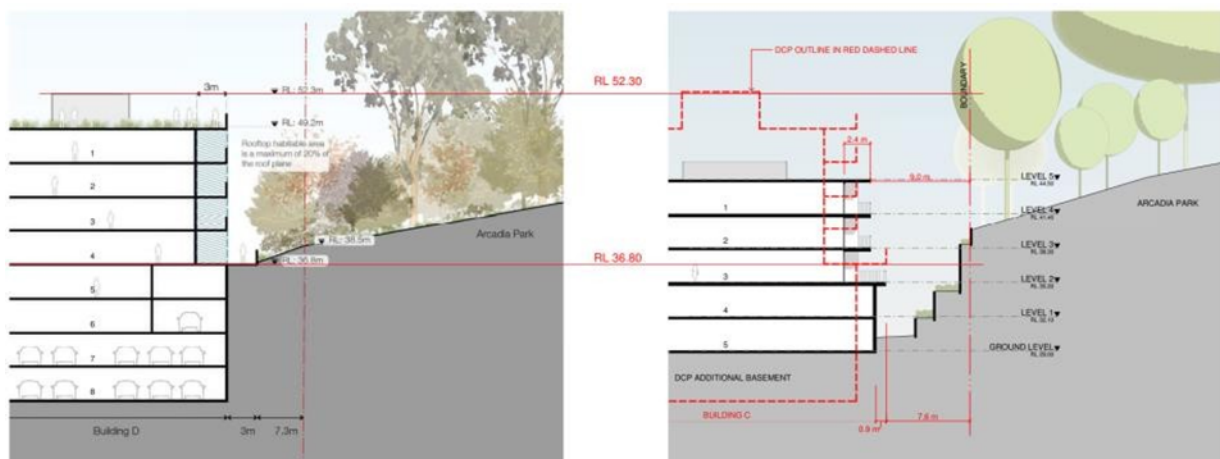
of DCP - Building C eastern boundary with Arcadia Park (shown left) and proposed cross section (shown right)
